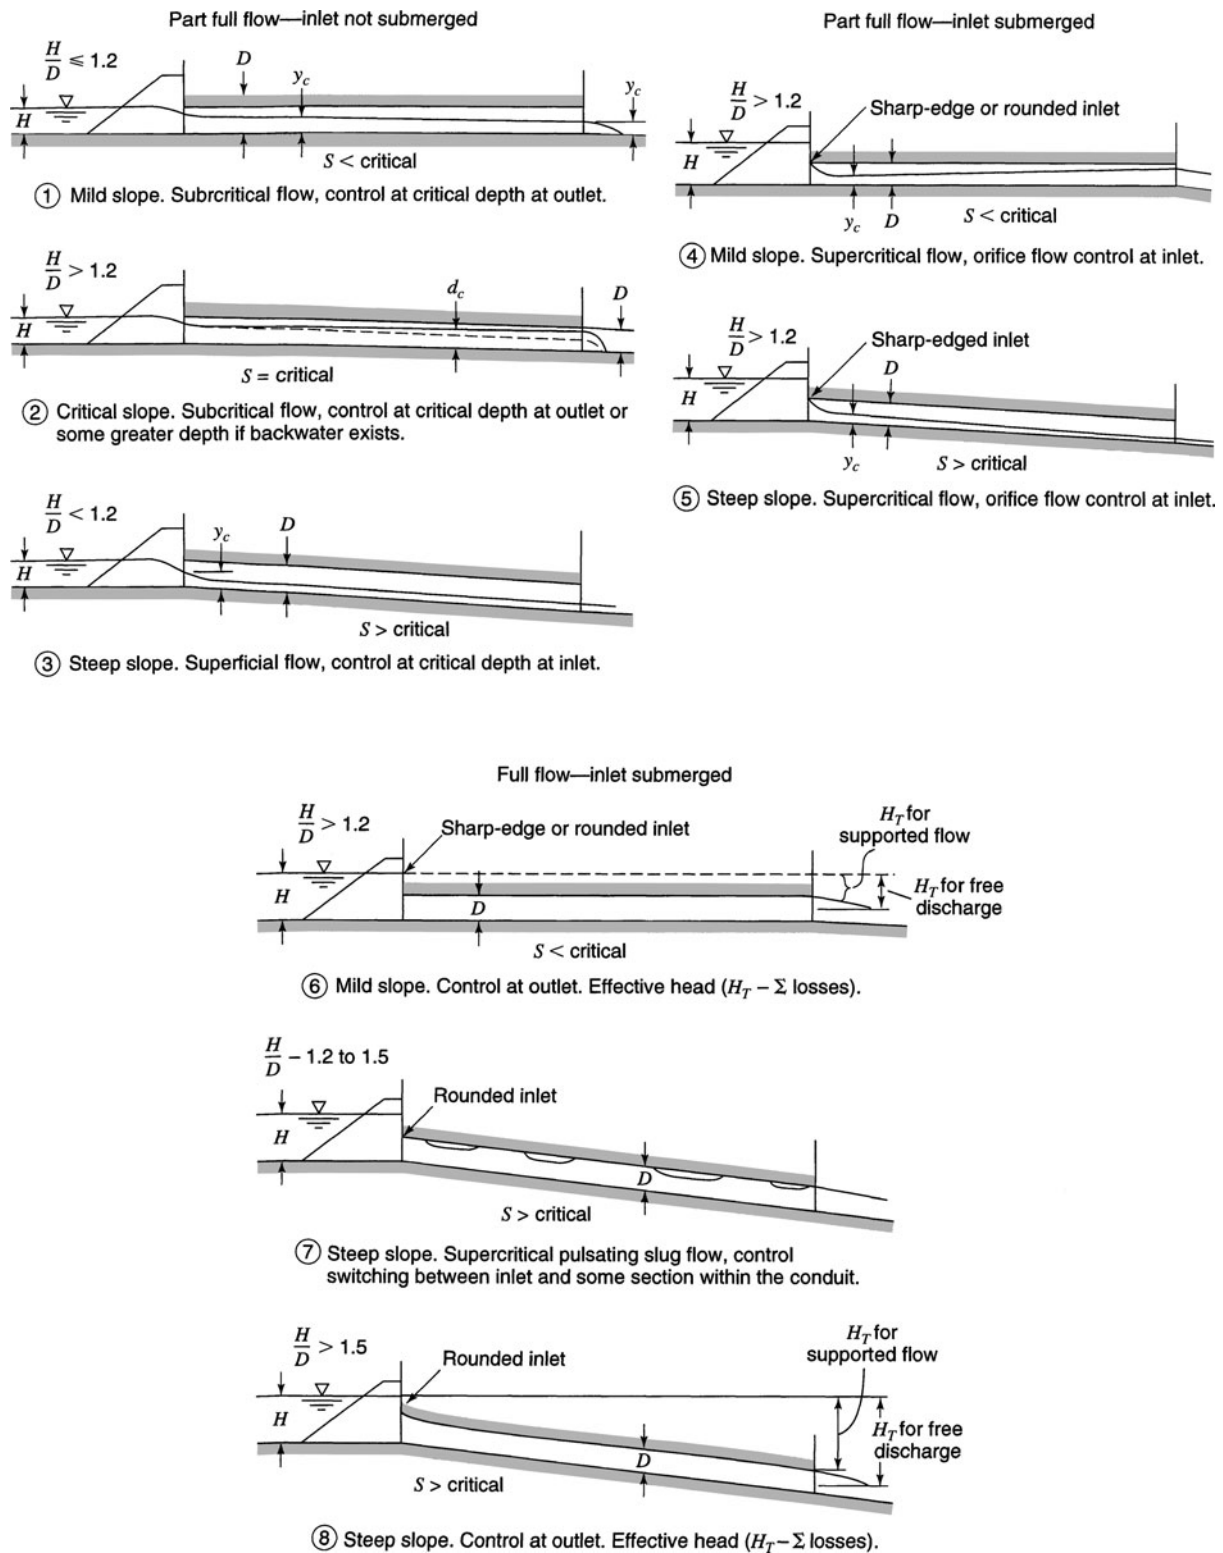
Typical flow conditions for culvert spillways on mild and steep slopes (from U.S. Bureau of Reclamation (1987)).
